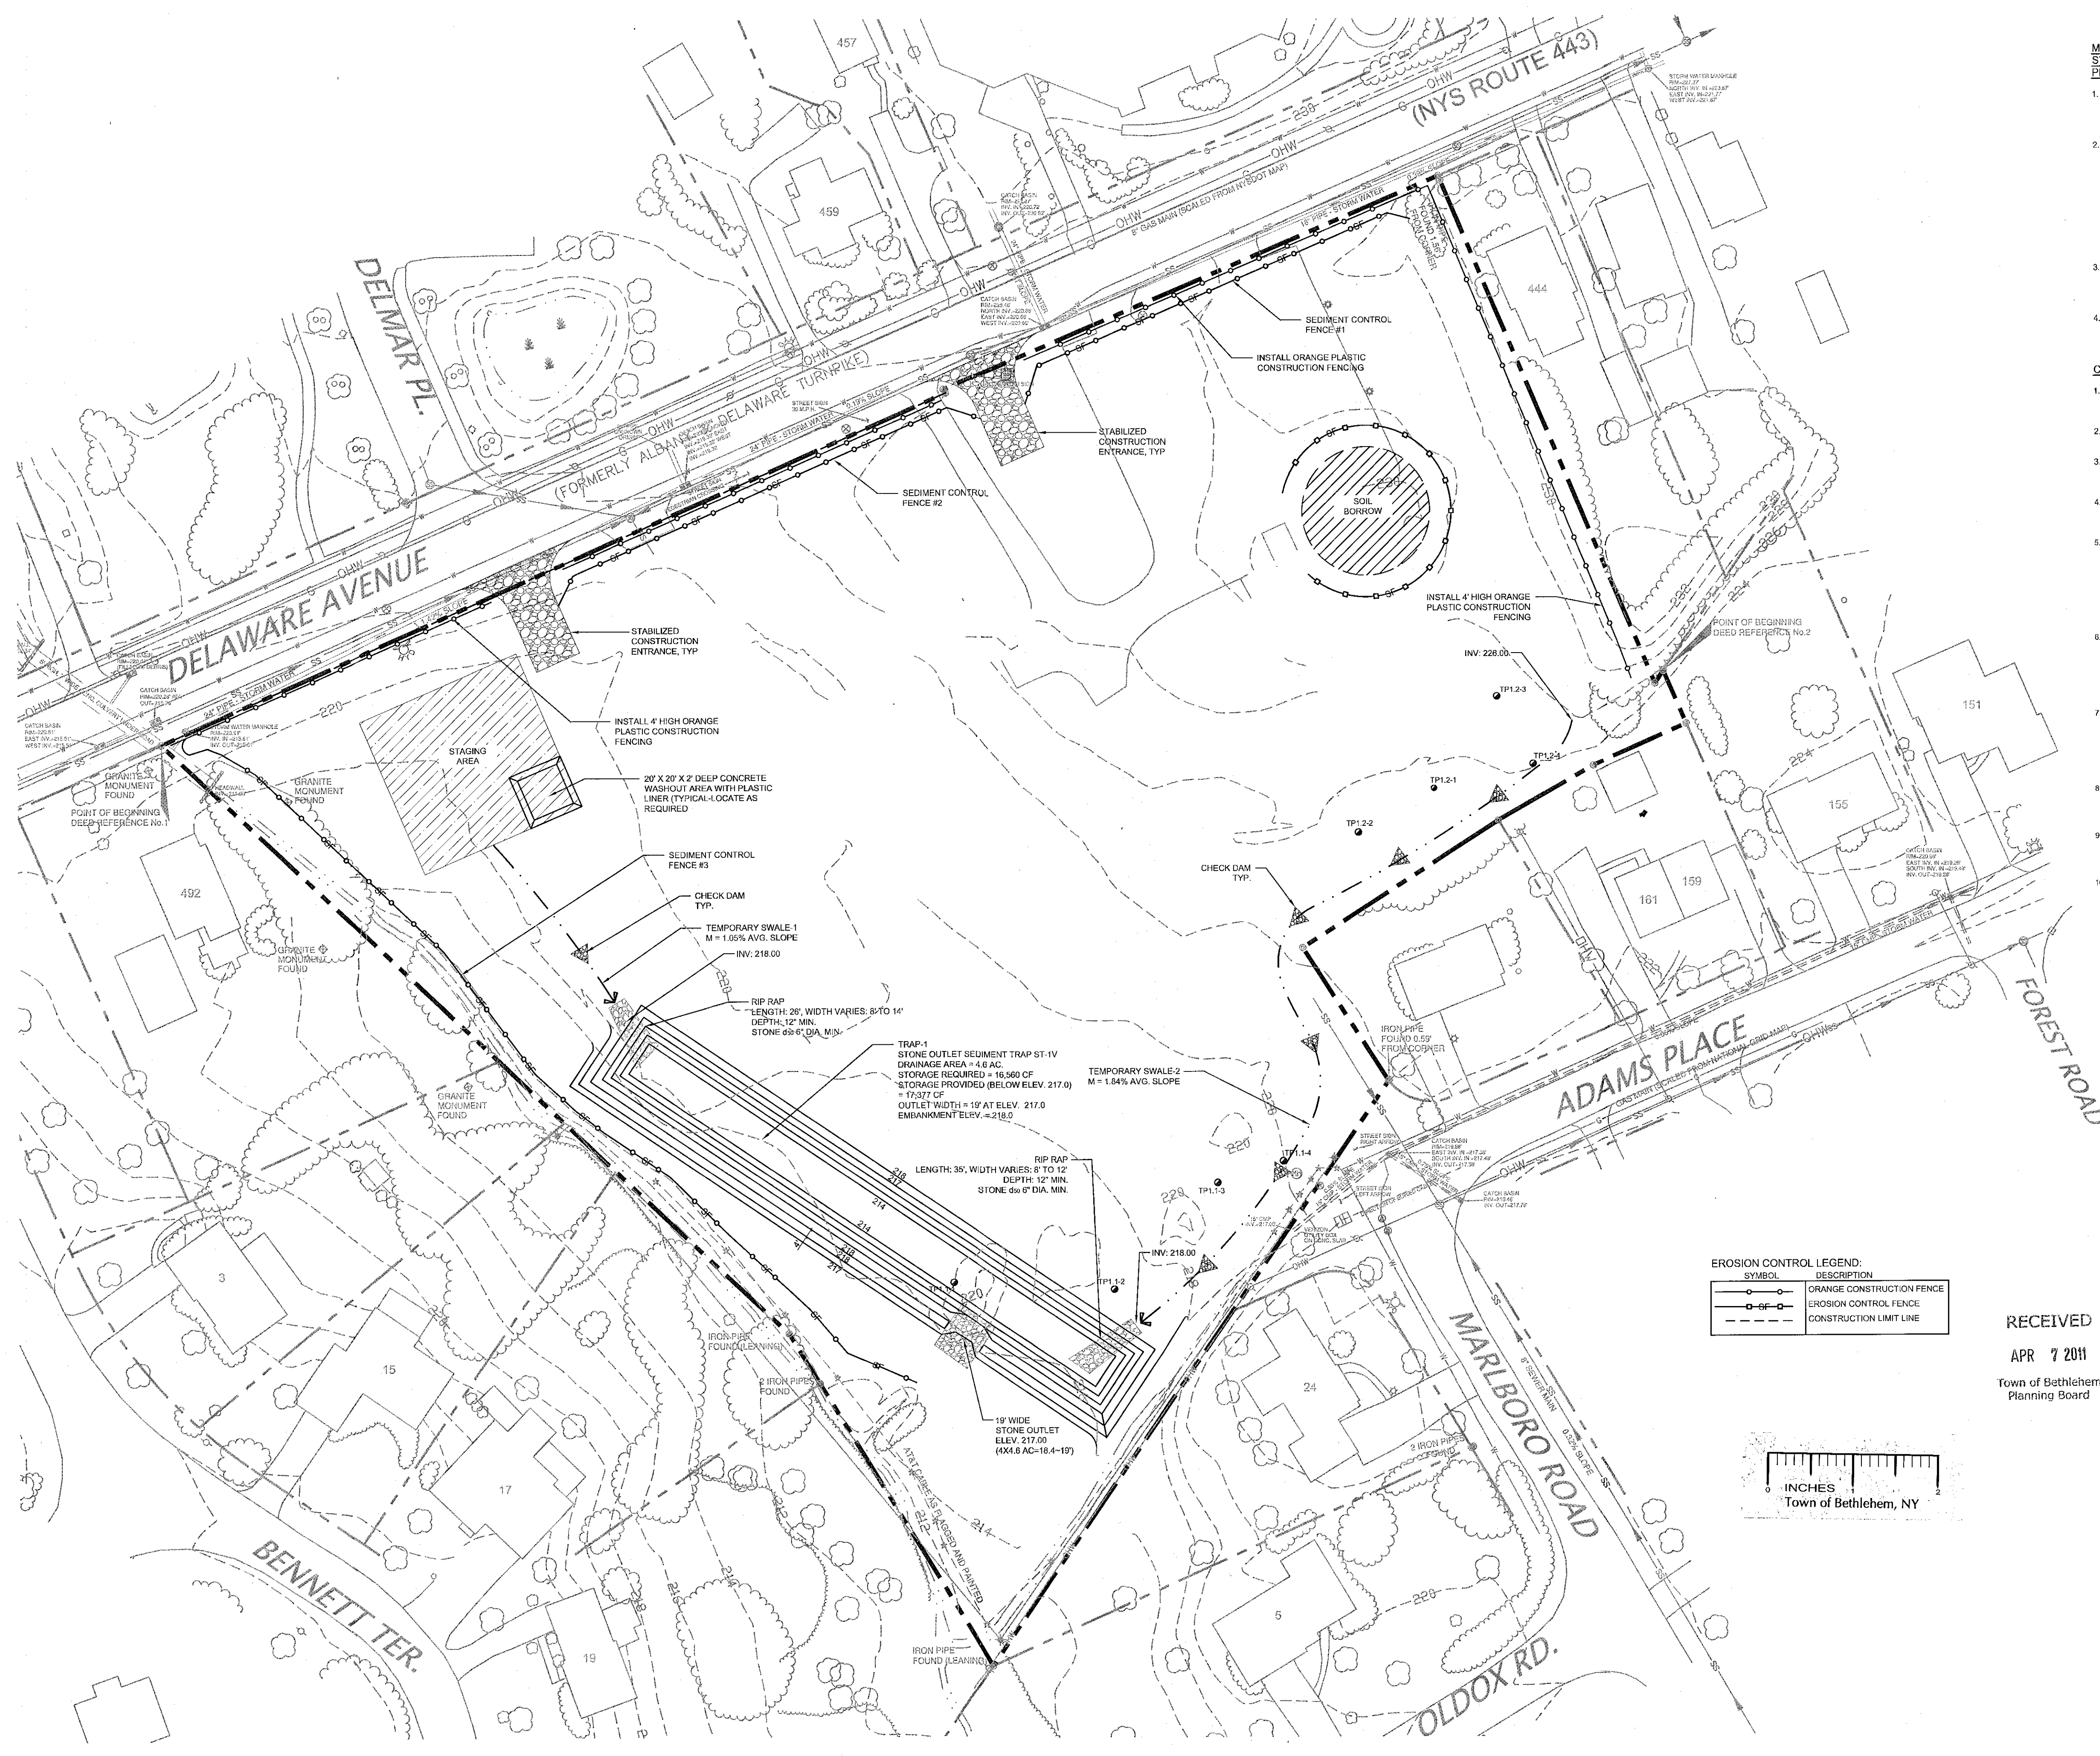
MESSING BUILDERS DELMAR'S PRELIMINARY SITE PLAN, EROSION CONTROL PLAN, SEDIMENT & EROSION PLAN, PLANS, 3/21/2011 11:47:17 AM. PLATUSE: 4/2/2011 12:08:57 PM. User: Ted Rowland
